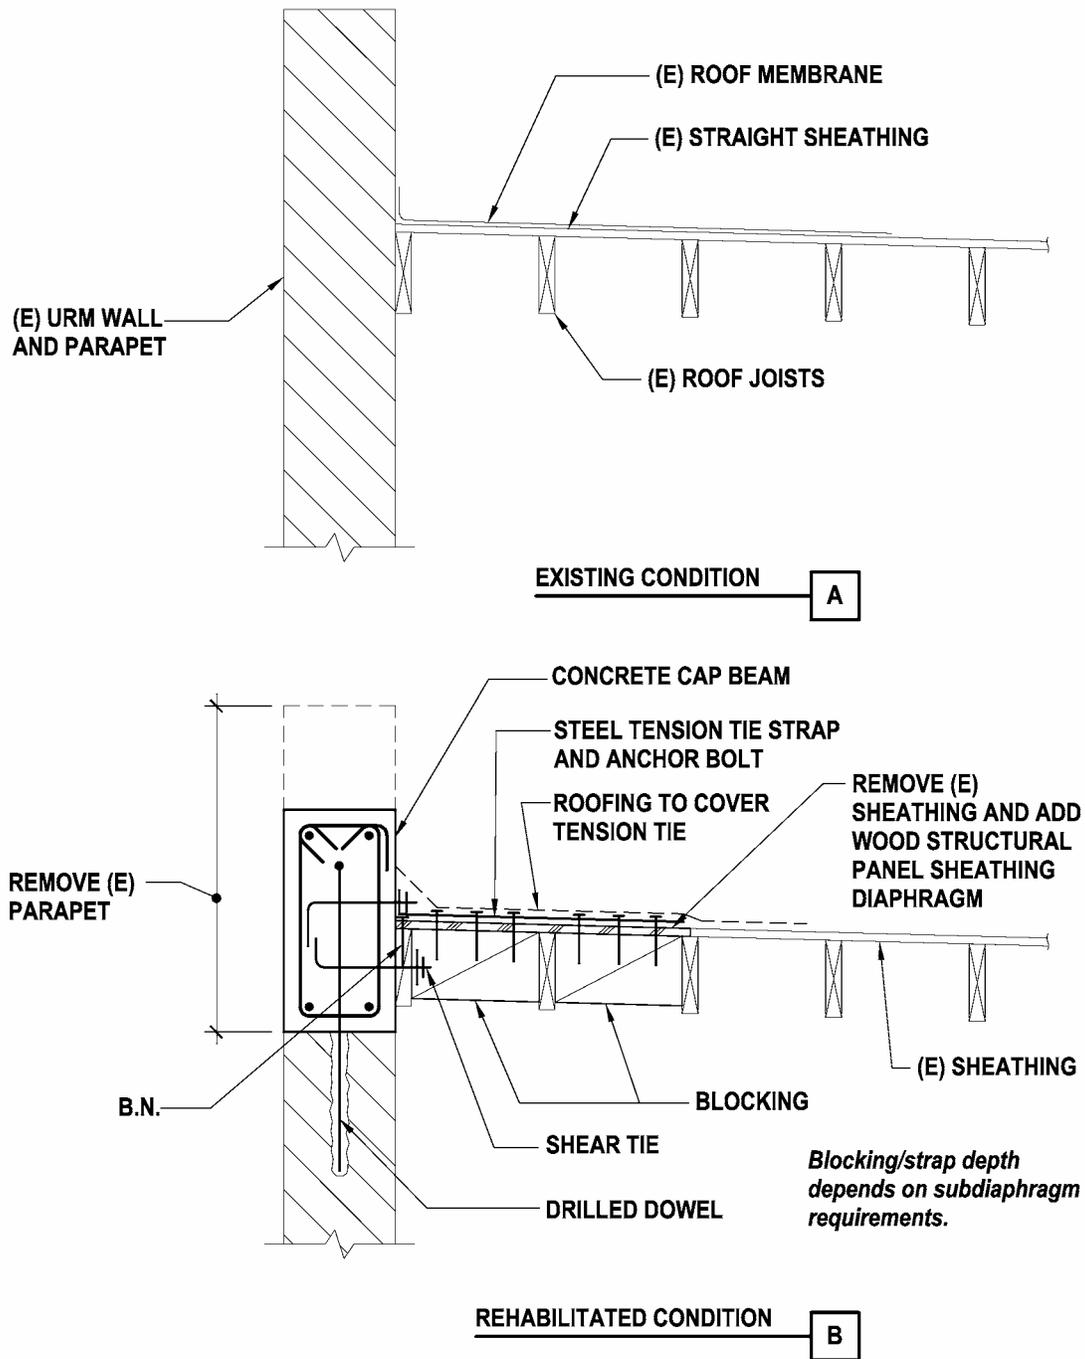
Parapet Removal and Concrete Cap Beam
